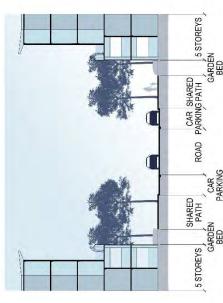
Hargreaves Street Plan Extract and Indicative Cross-Section
